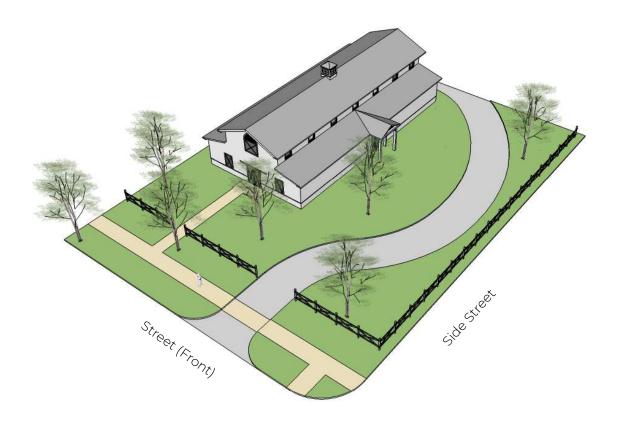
Illustrative example of buildings and site arrangement in the T2 Rural Zone.
